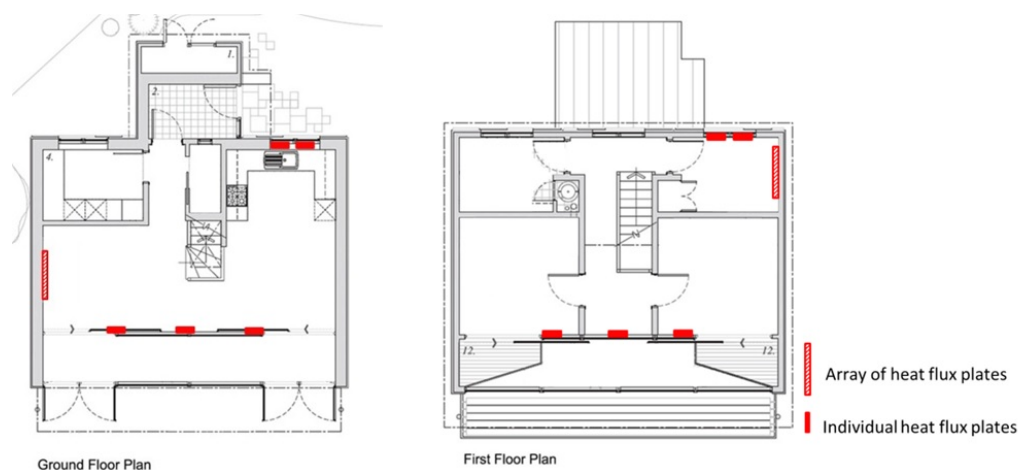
Ground floor (left) and first floor plan (right) of the test house and location of heat flux sensors
